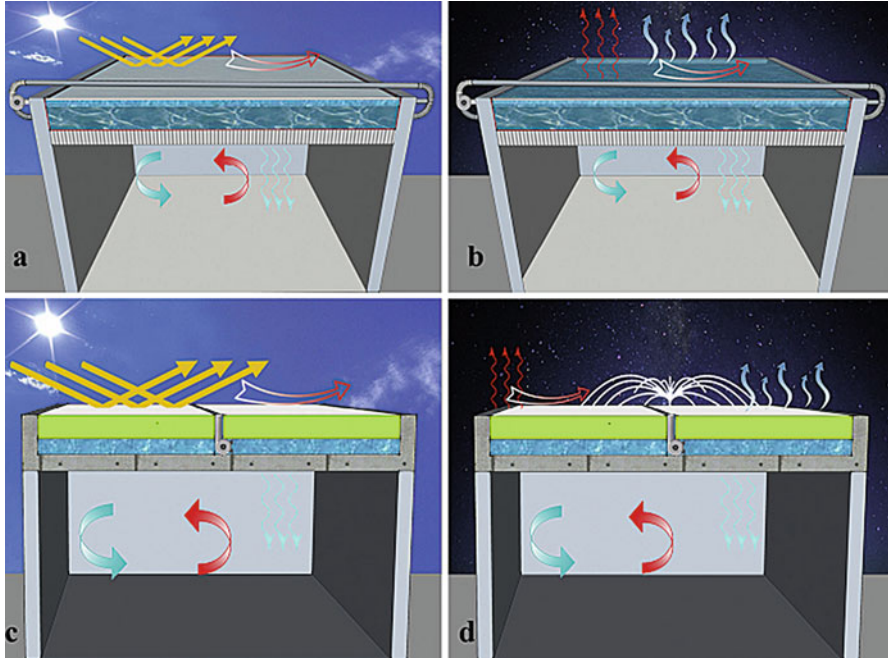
(a and b) Energy roof; (c and d) cool roof [27]
